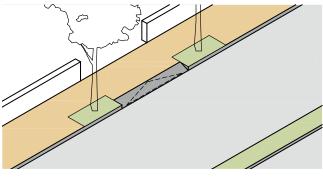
Where footpaths are ramped down to the level of the carriageway, the maximum ramp slope is 1:12.
